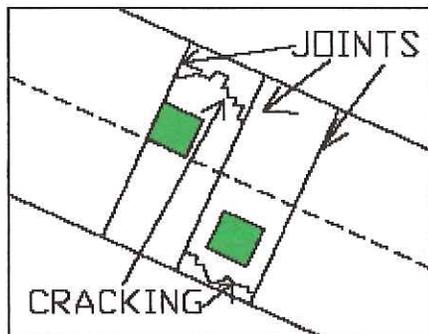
Do not leave strips of pavement less than one-half lane in width.
